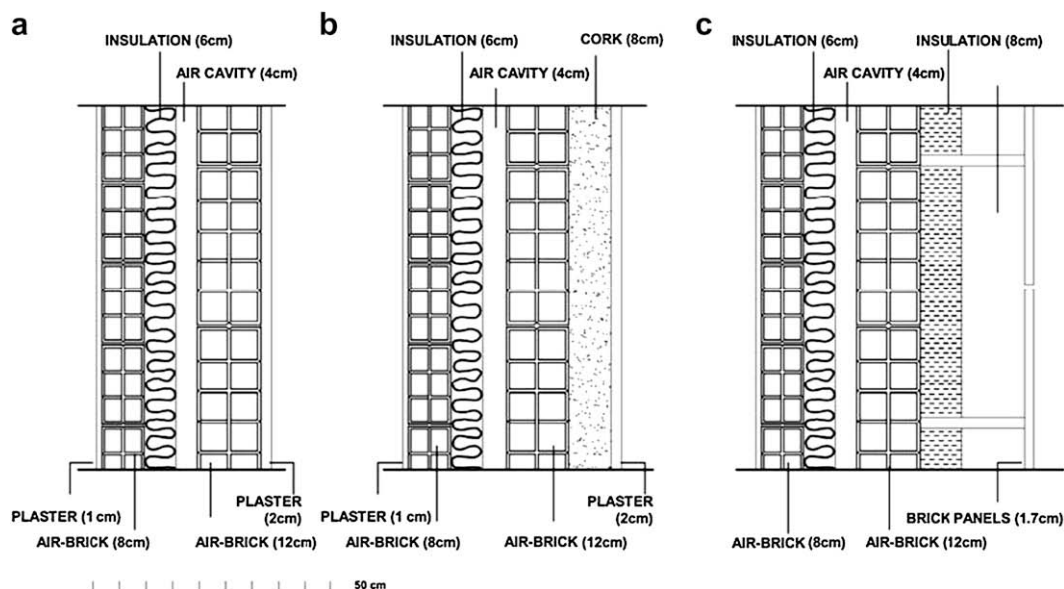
(a) Traditional air-cavity wall; (b) plus-insulated wall; and (c) ventilated wall.
